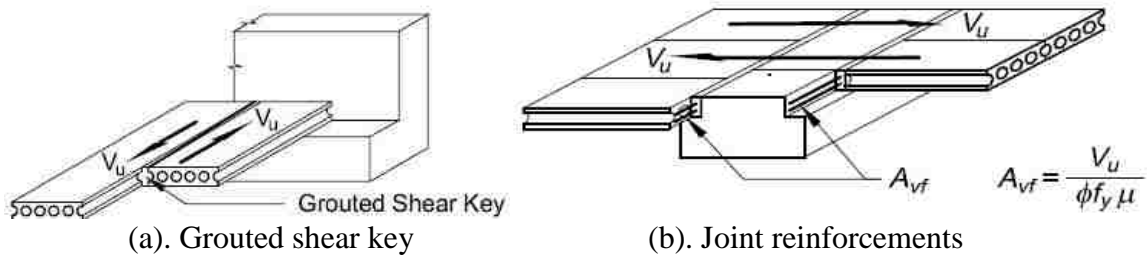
Connection details for the precast hollow-core floor systems (PCI 2010)
